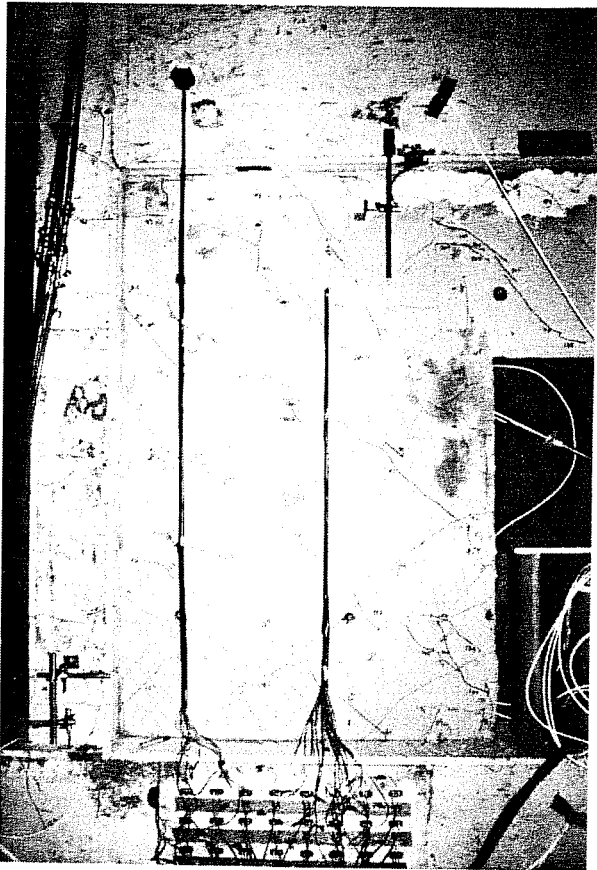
Crack Patterns, Cycles to 0,50% Drift, North Pier
